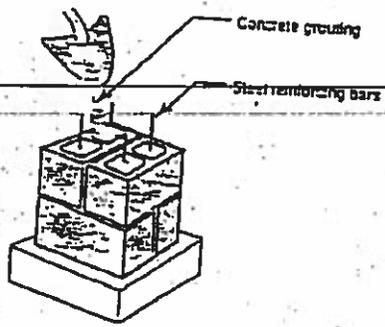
(b) For piers exceeding 80 inch in height the concrete blocks should be filled with concrete grouting and steel reinforcing rods utilized.
